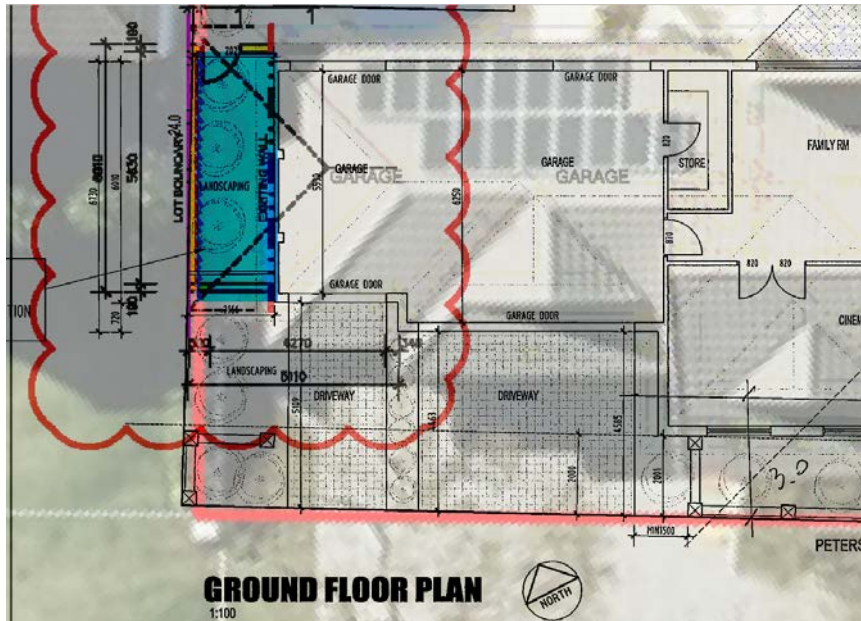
Floor plan of the subject site. The portion being extended is highlighted in blue.
